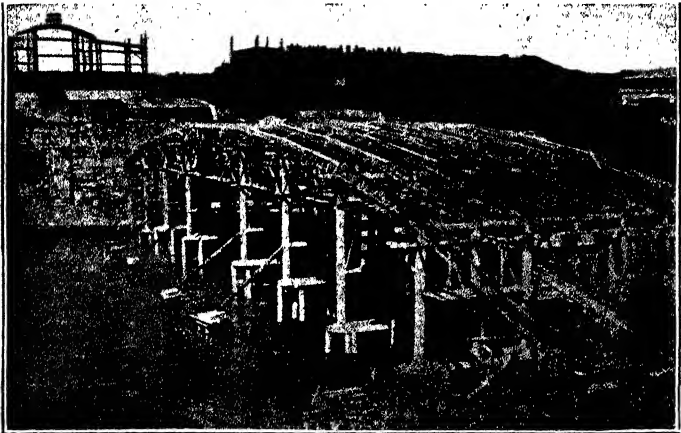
Reinforced concrete bridge under construction, showing centering and casing for concrete ribs.
